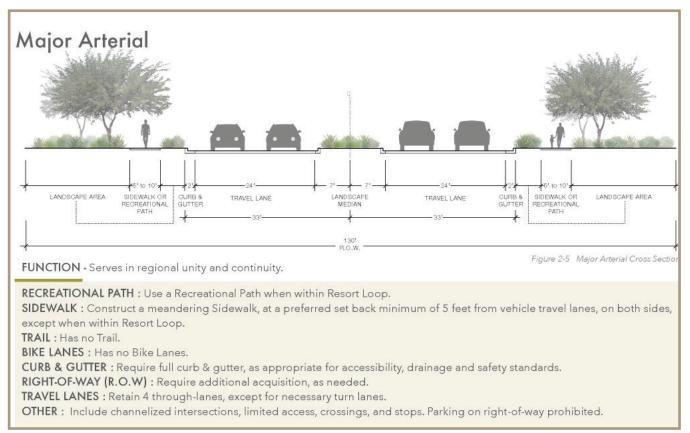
Typical Major Arterial Cross-Section, Town Walk & Bike Plan 2018
